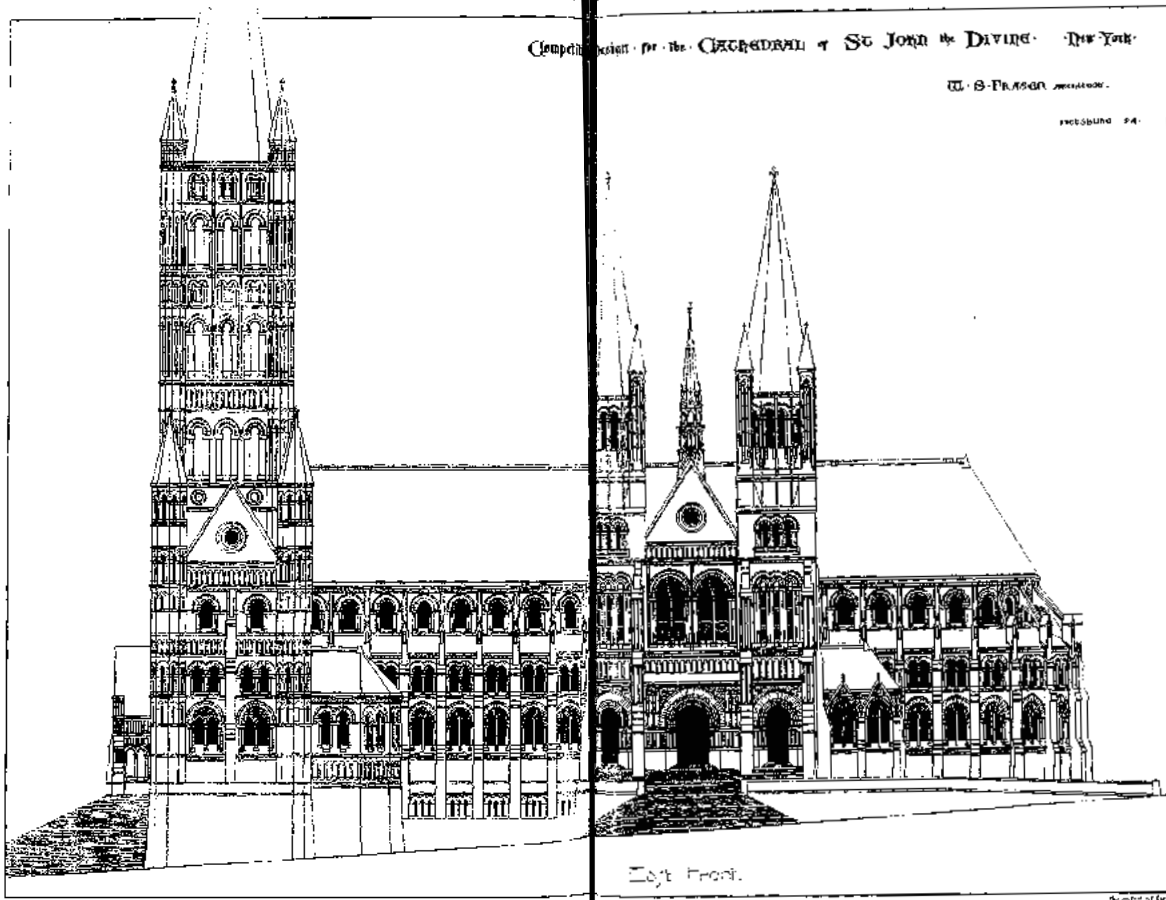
Fraser's elevation drawing for the Cathedral of Saint John the Divine, *The American Architect and Building News*, 5 October 1889.
